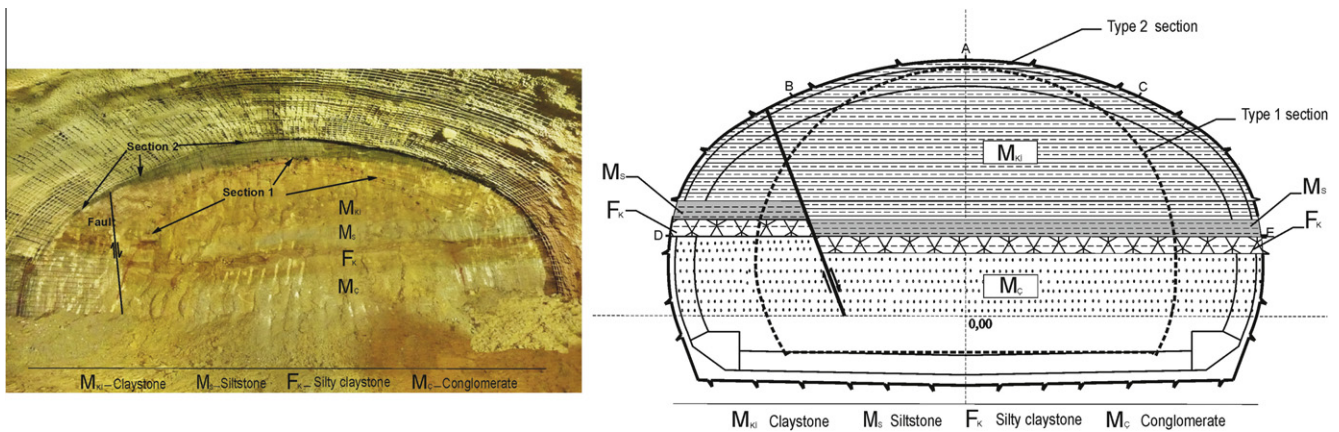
Fault zone at tunnel face (type 2 to type 1 intersection).
